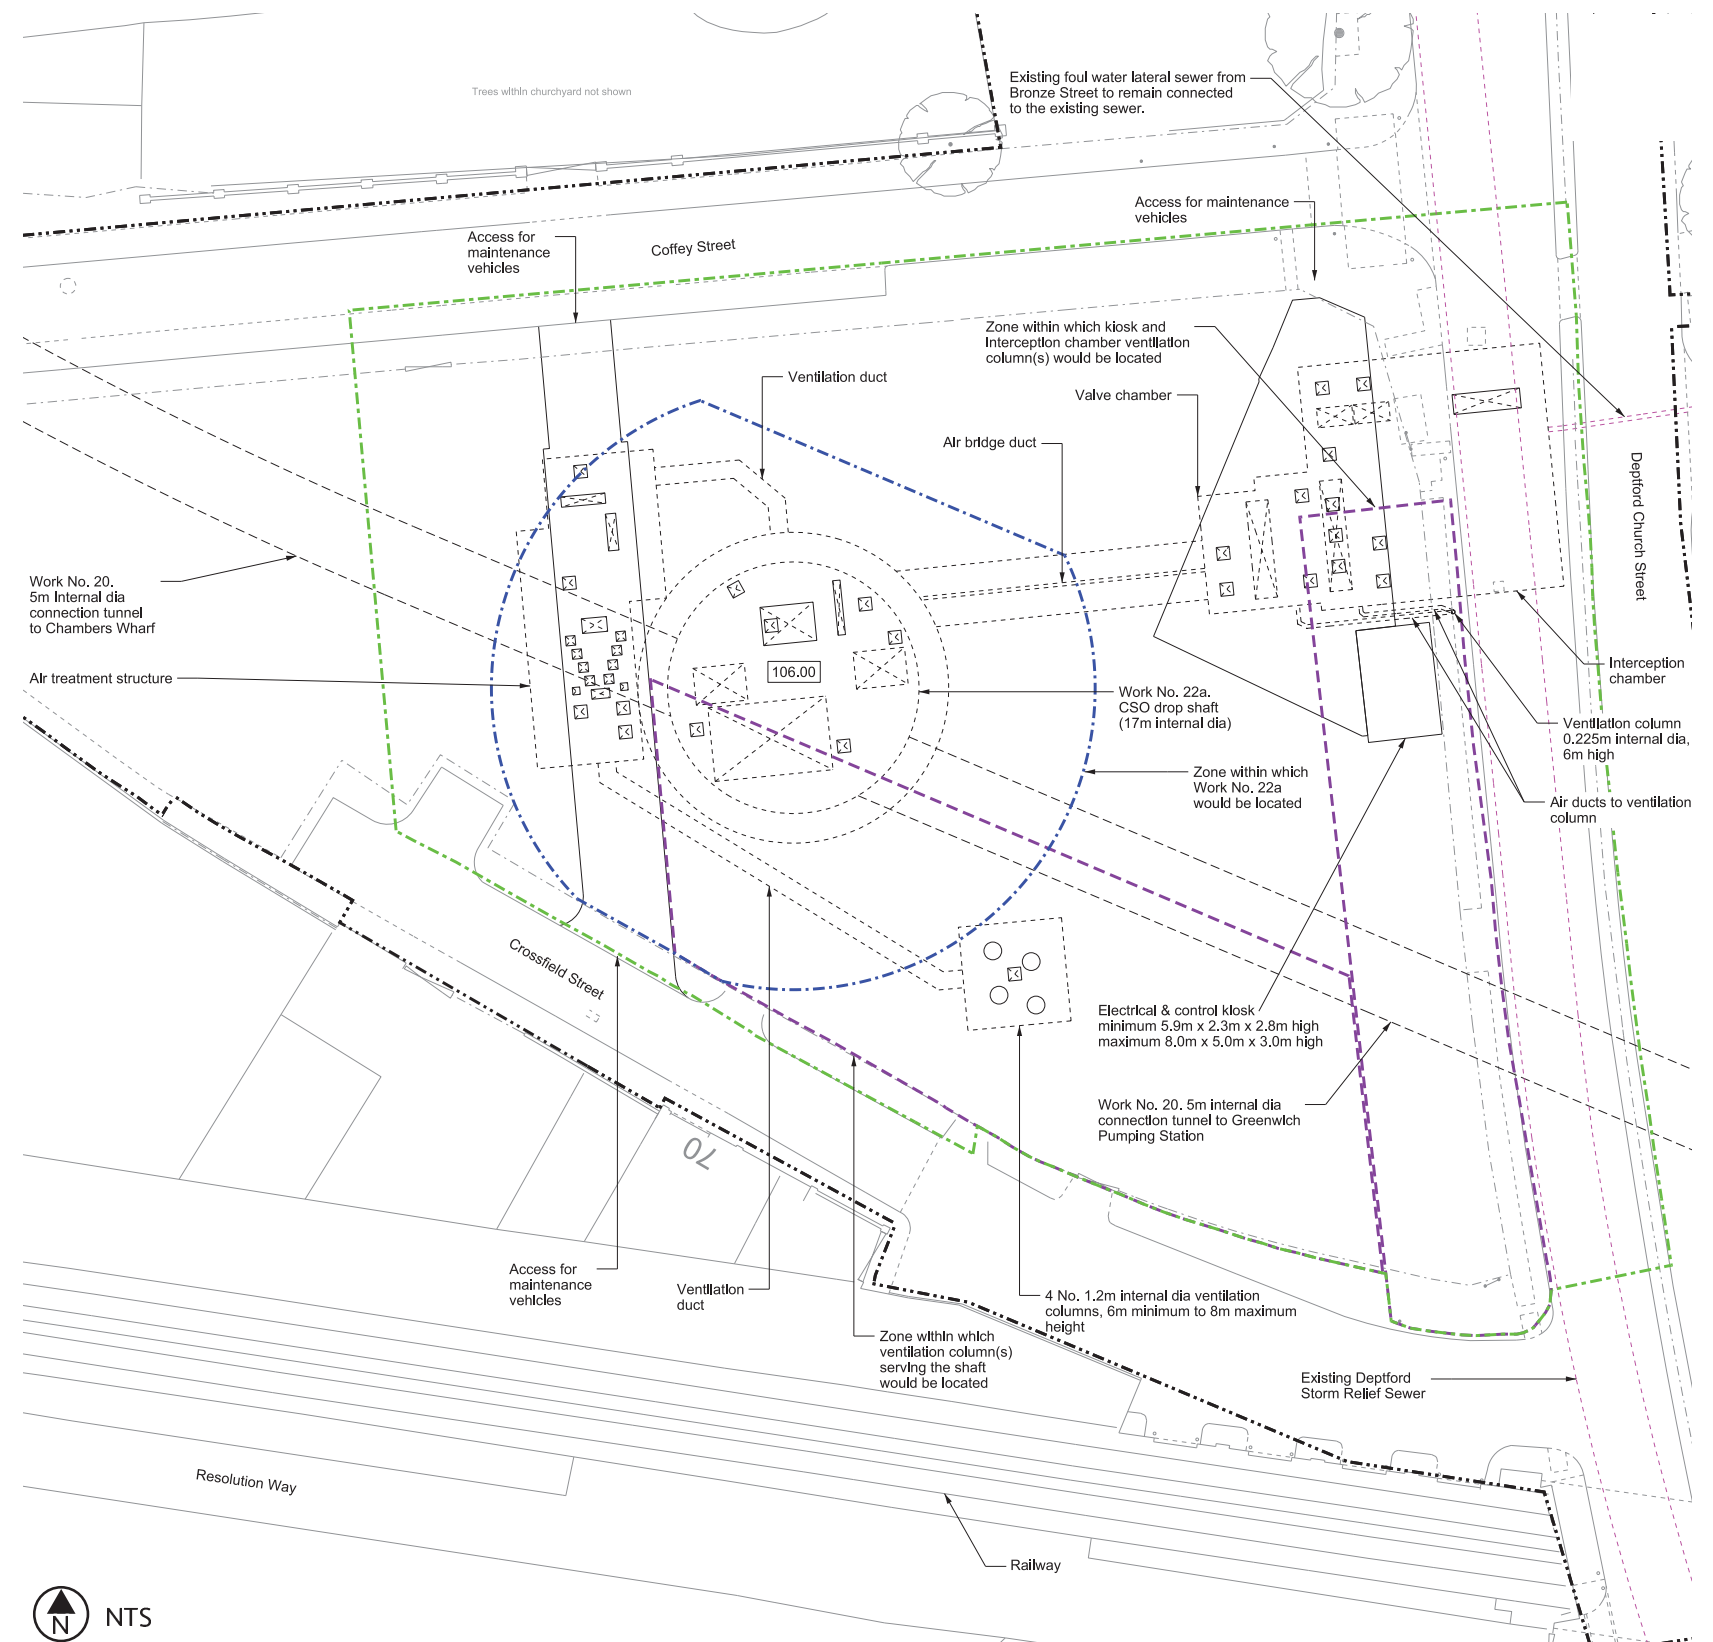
Permanent work layout plan- refer to the Permanent works layout in the *Book of Plans
